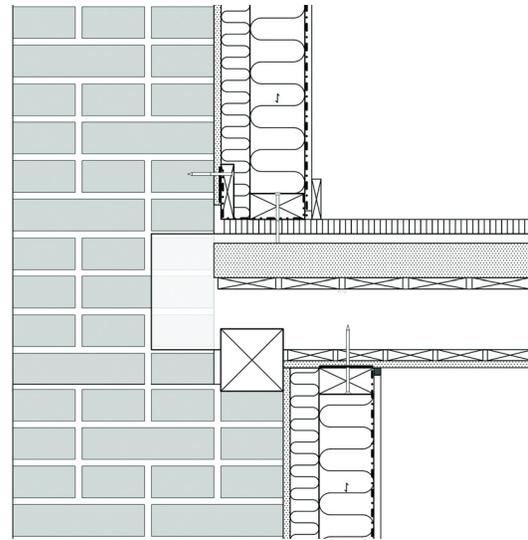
Vertical section of the joint between the load-bearing wall, which is the facade, and the horizontal division after post-insulation.
